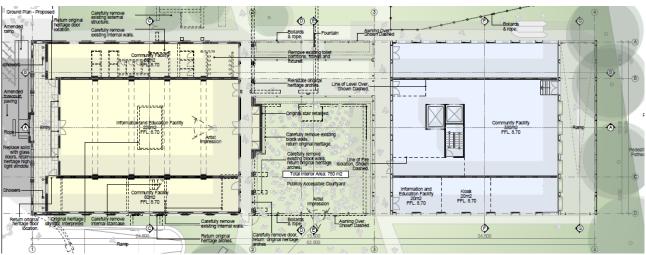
Proposed ground-floor plan Source: Lockhart-Krause Architects, 2021
